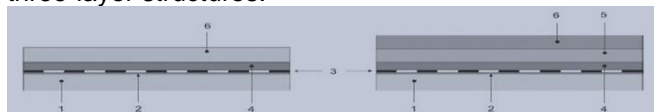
Pavement structure for parking decks: a) Structure with two layers, b) Structure with three layers
